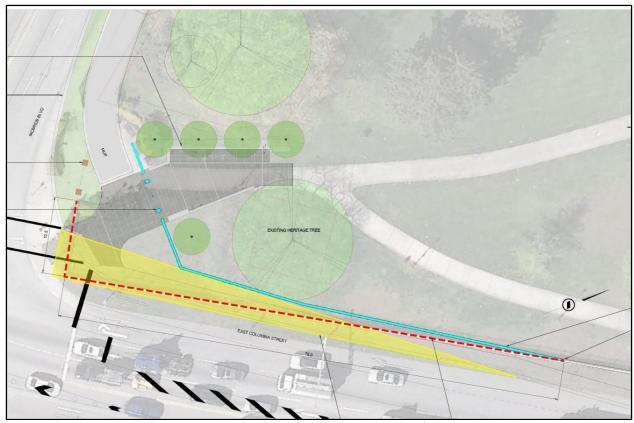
Diagram of proposed wall demolition (dashed red), new wall construction (solid blue), and vehicle site-triangle zone (shaded yellow)
